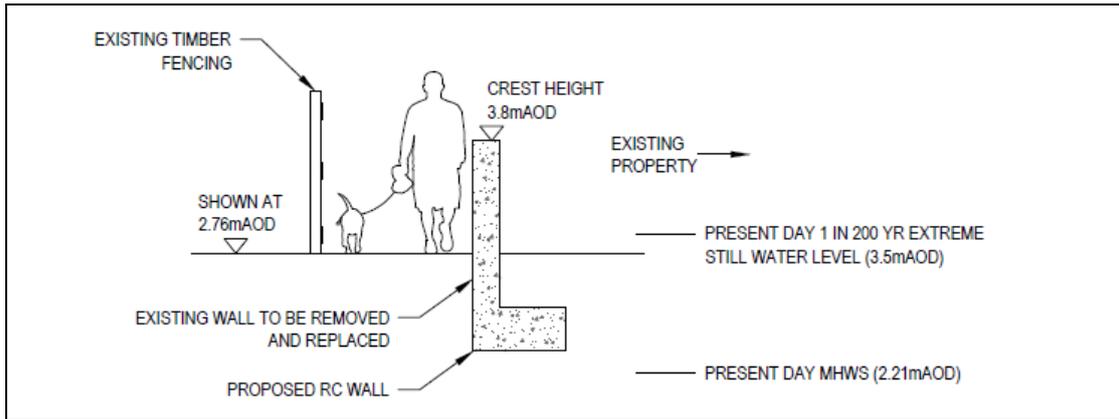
Sketch of indicative floodwall cross section along the footpath (looking south) (not to scale)
